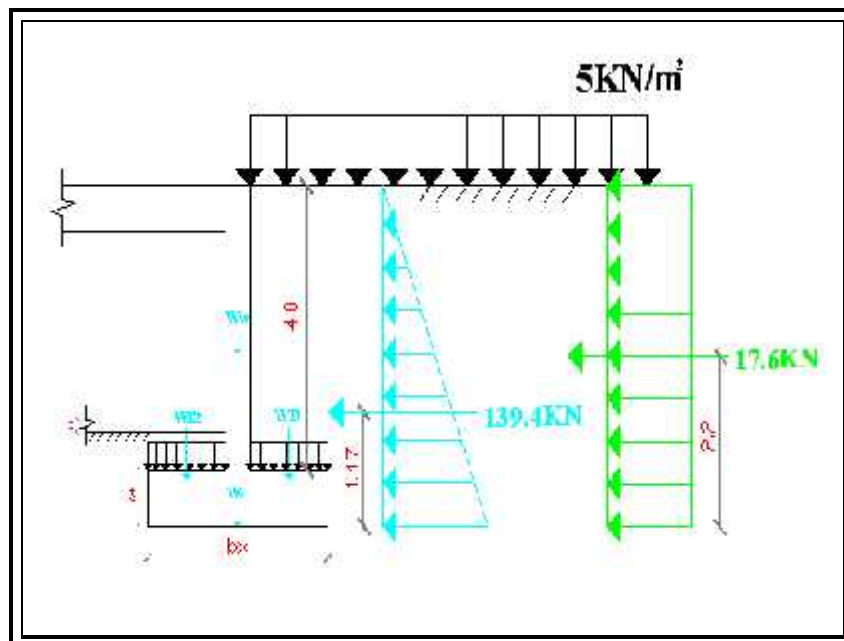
Geometry and load of Basement Wall and strip footing.
